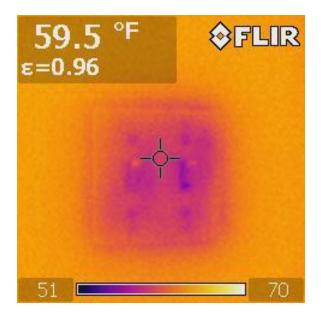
Infiltration Detection—Light Switch on Exterior Wall
